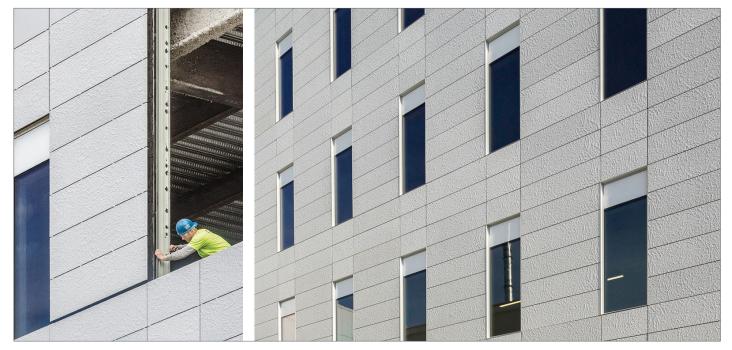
University of Alaska, Fairbanks. A BVDC curtain wall unit shows open joint panels with an extruded aluminum perimeter frame.
